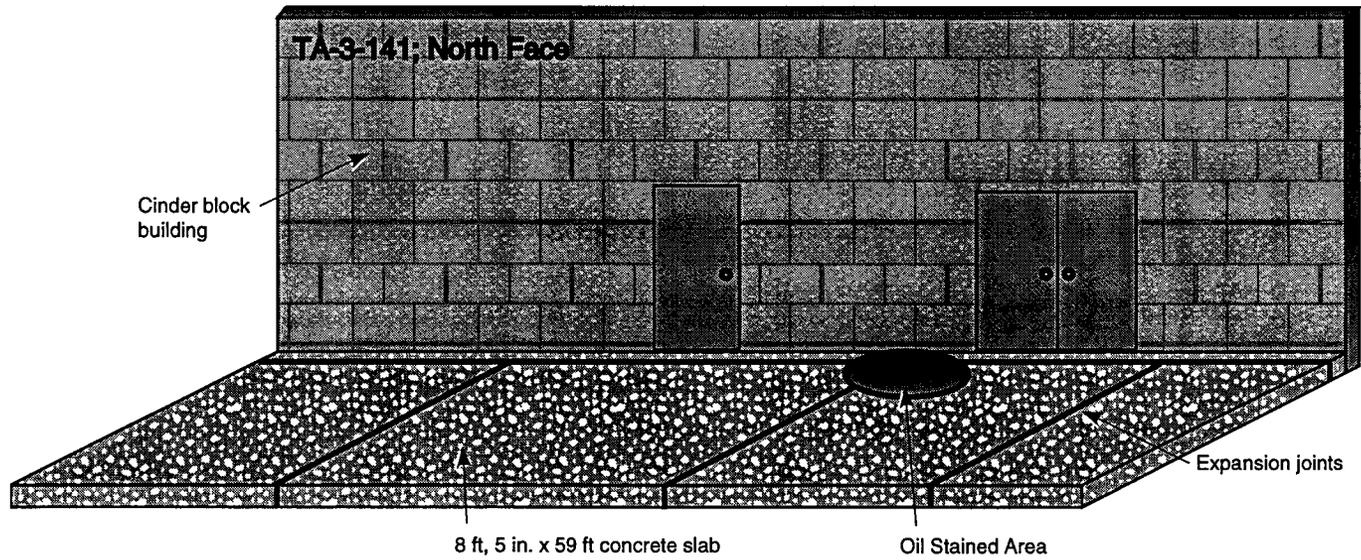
Detail of concrete slab at TA-3-141, PRS 3-047(g) showing expansion joints and the only stained area near an expansion joint (response to Deficiency 34).
